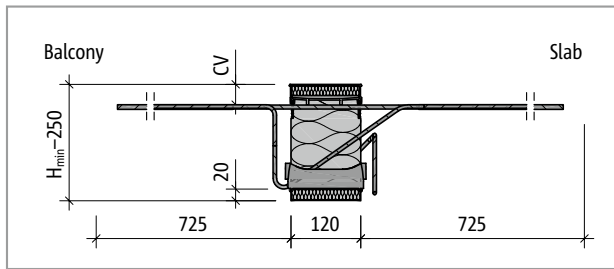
Schöck Isokorb® XT type K-M8: Product plan view
